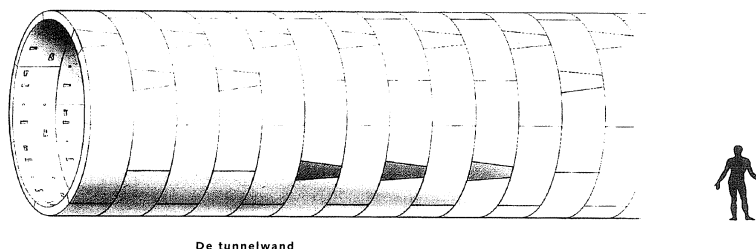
Tunnel lining consisting of rings composed of elements and keystones.
